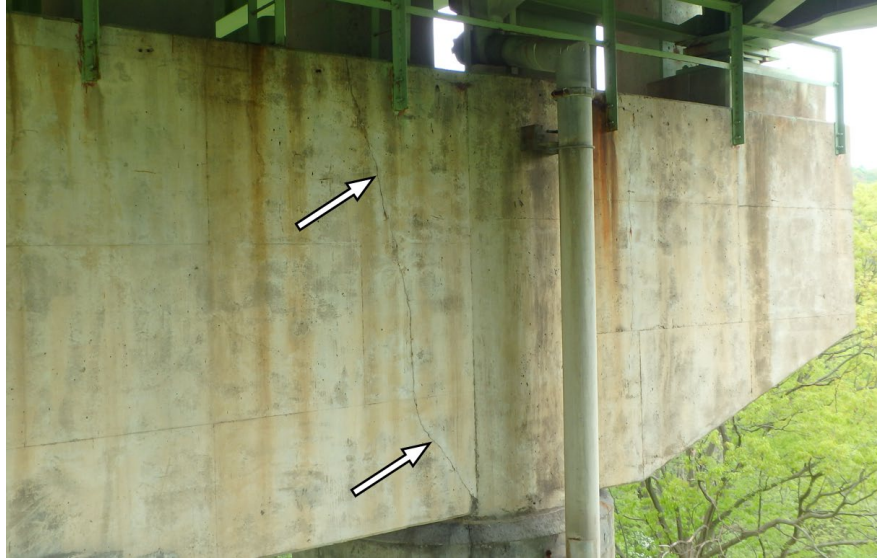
Crack in Shear Zone of a Pier Cap
